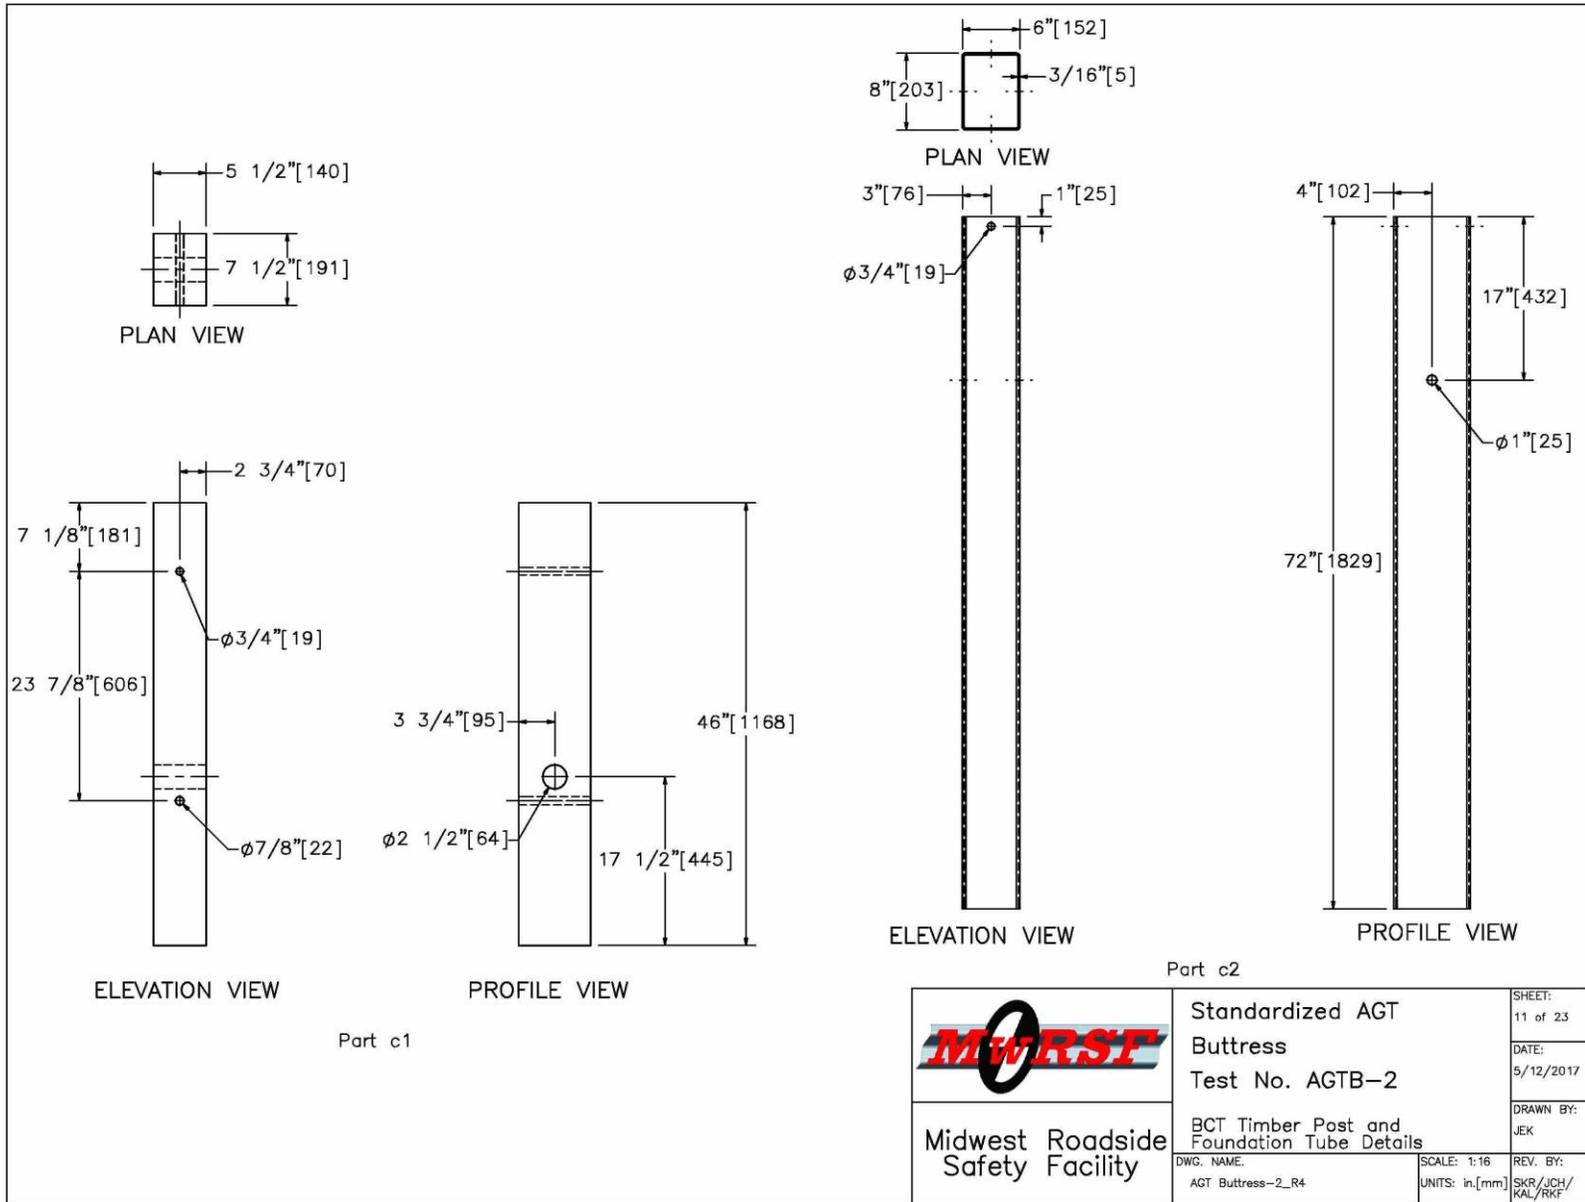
BCT Timber Post and Foundation Tube Details, Test No. AGTB-2
